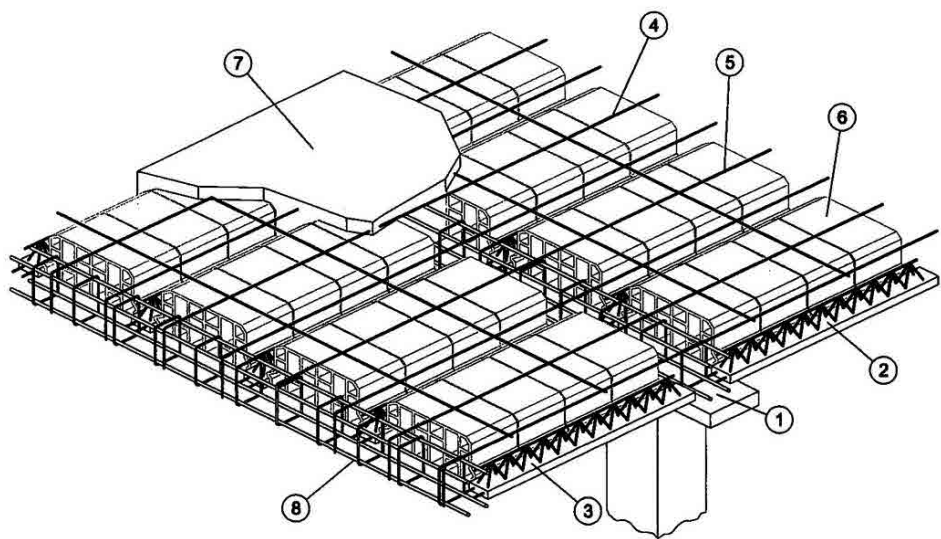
One way spanning slab with cantilever- joists with basical reinforcement (grid layout). Design by Susana Mora.
